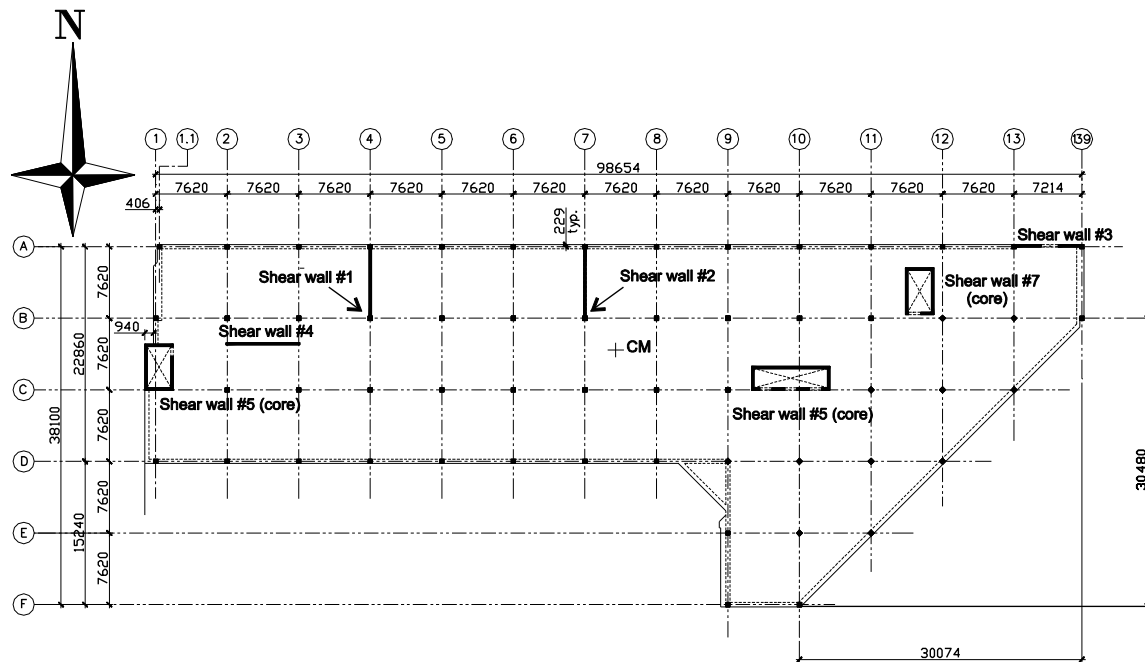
Typical plan view of the analyzed reinforced concrete building (from Panneton et al. 2006).
